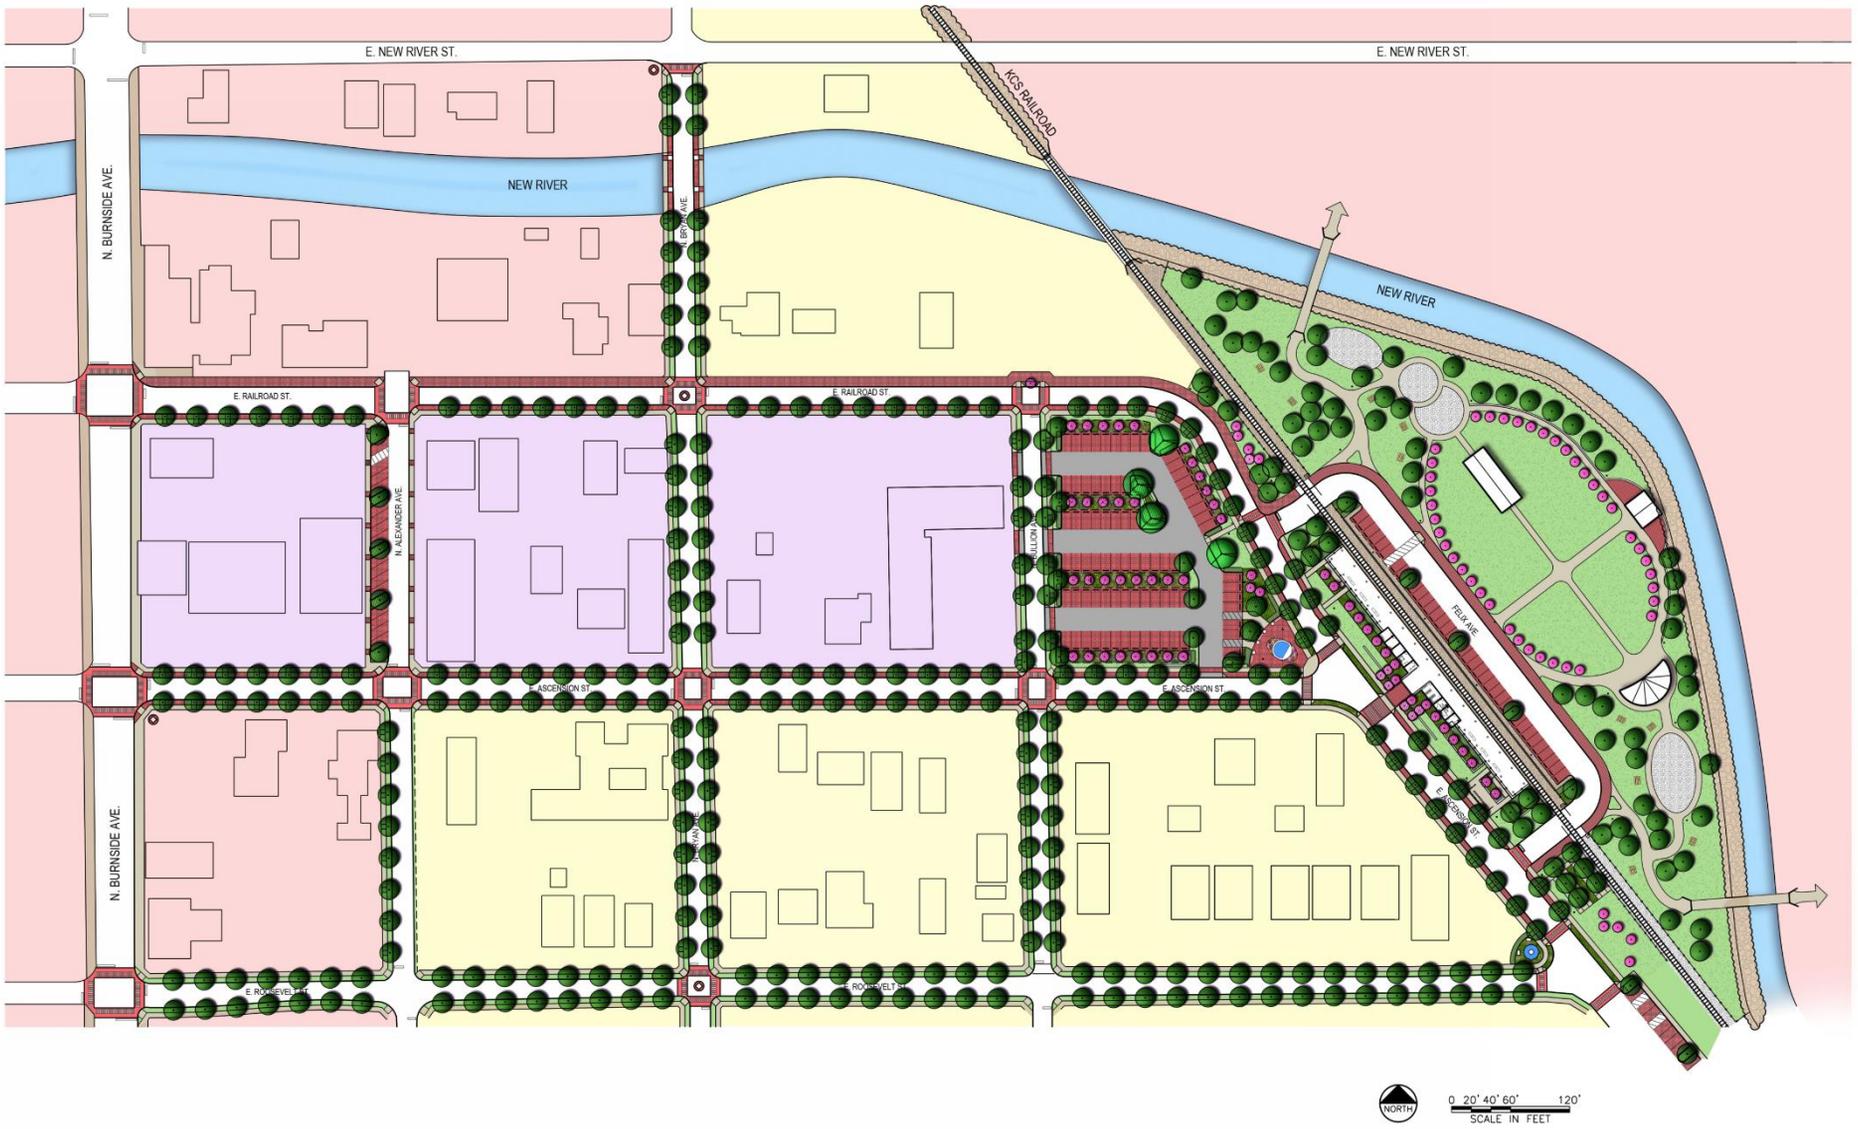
Future Site Redevelopment Scenario Rendered Plan
